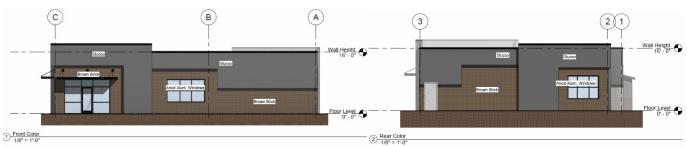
Left: Restaurant/retail with drive-thru front (main entrance) elevation. Right: Restaurant/retail with drive-thru rear elevation.
